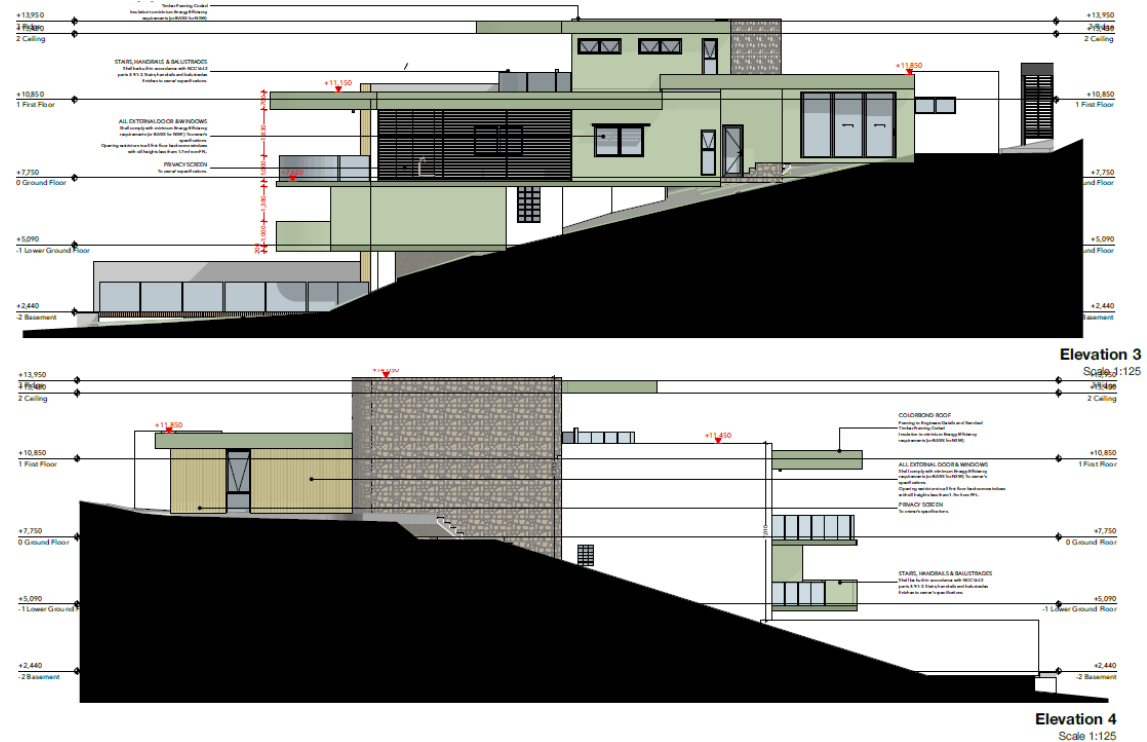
Proposed Elevation 3 (North) and Elevation 4 (South)
